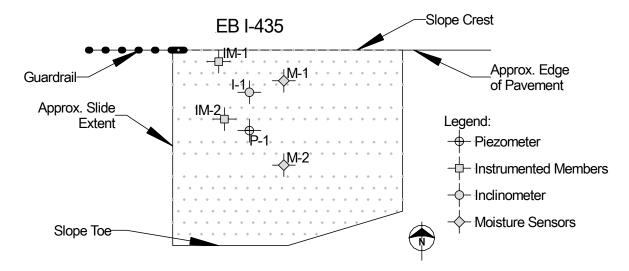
Instrumentation layout for I435-Holmes Road site.
